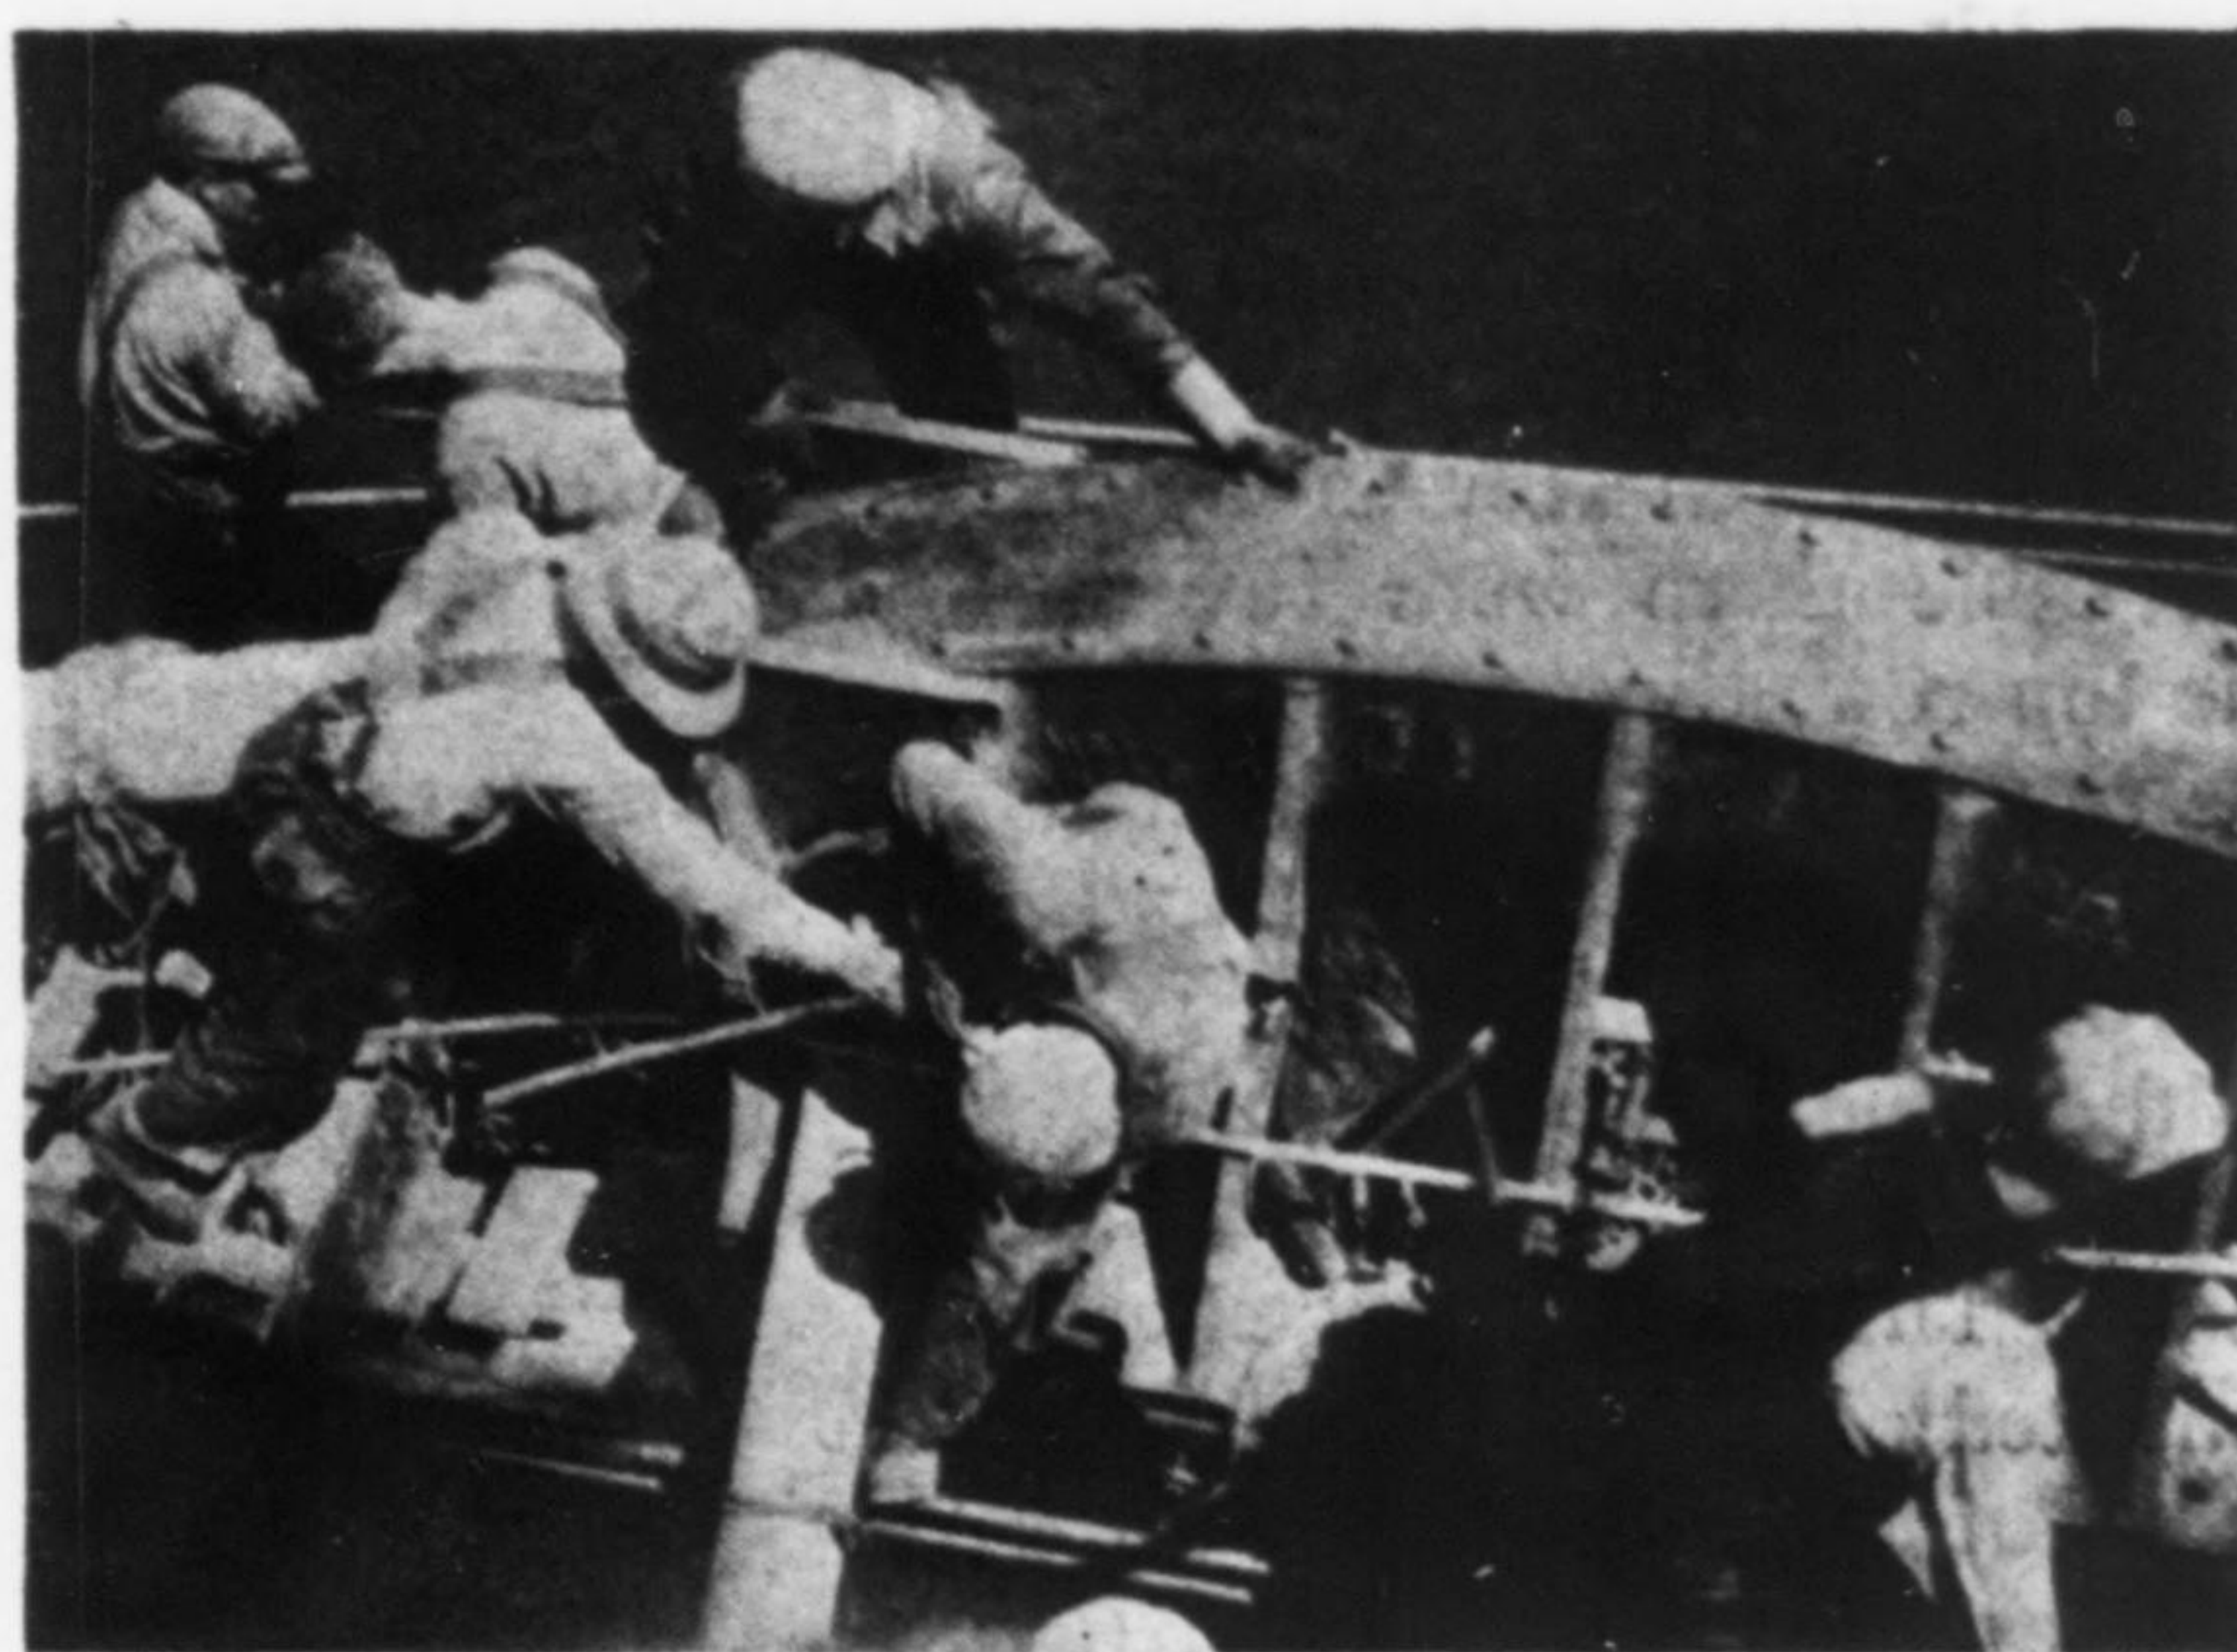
JACKING THE MAIN TOWER SADDLE AT MOUNT HOPE
